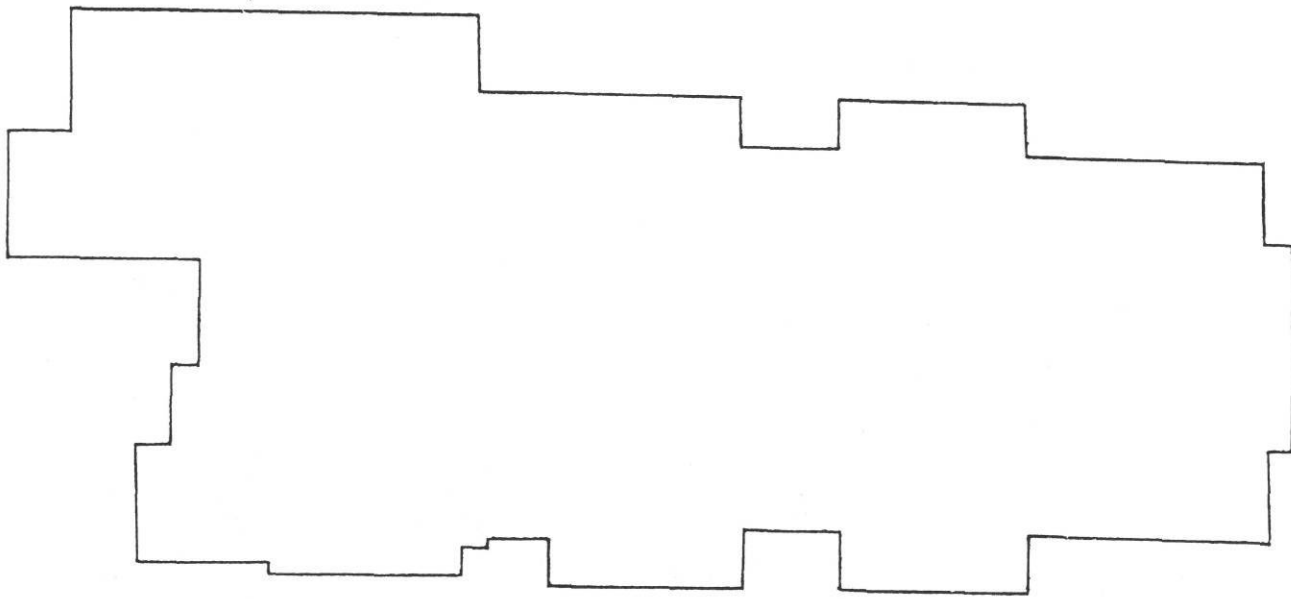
Floor Plan of Sims Elementary School (SES) (adapted from Landman, 1996a)
